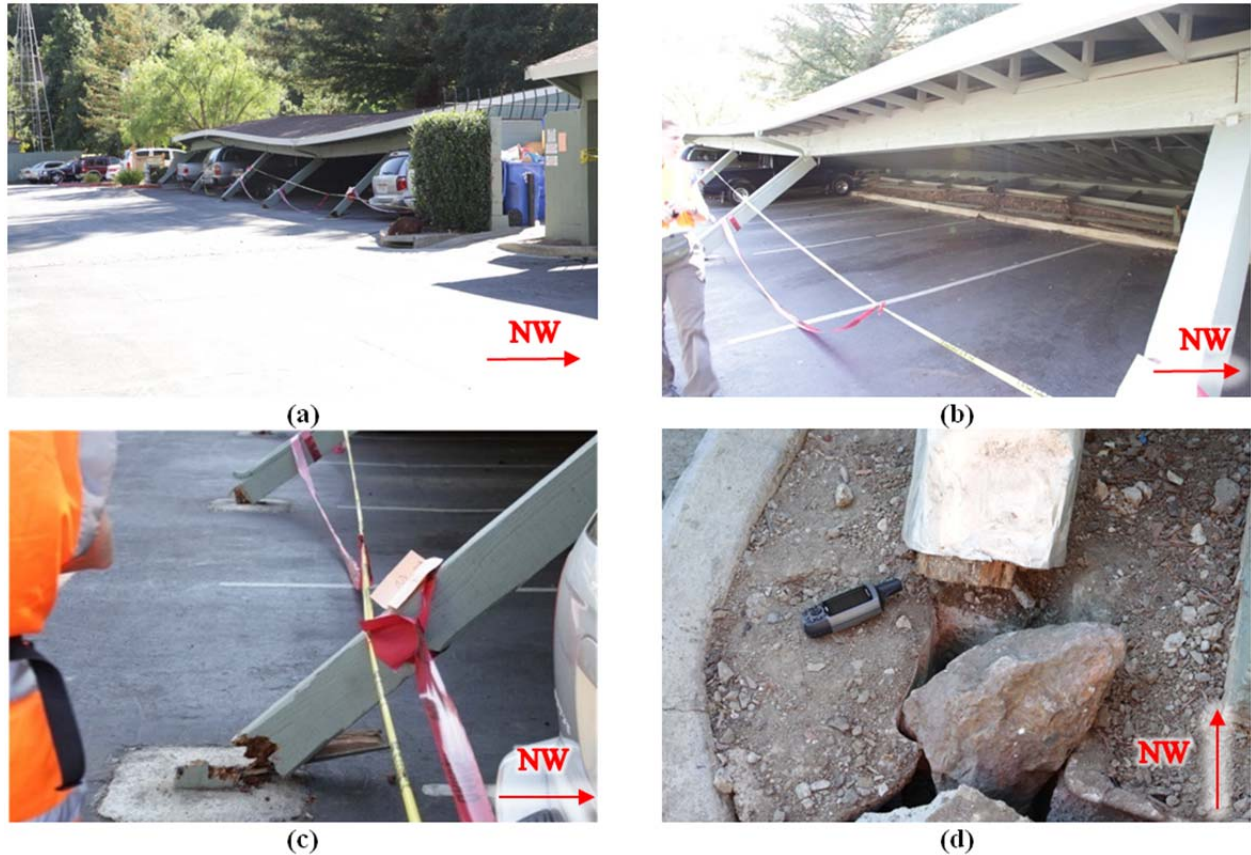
Collapse details for Carport #1: (a) overall collapse along length of carport; (b) view of collapse of longitudinal wall; (c) sheared interior columns; and (d) wrapped timber column pull-out on north end.
